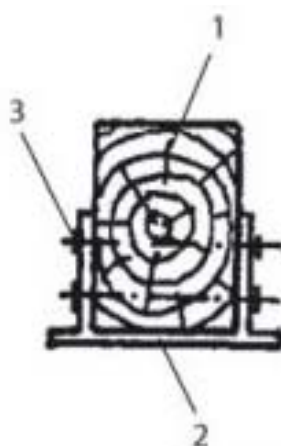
Reinforcement of the beam by steel U-profile: 1 – timber beam, 2 – reinforcing steel U-profile, 3 – connection between two materials (<http://www.asb-portal.cz/>)
